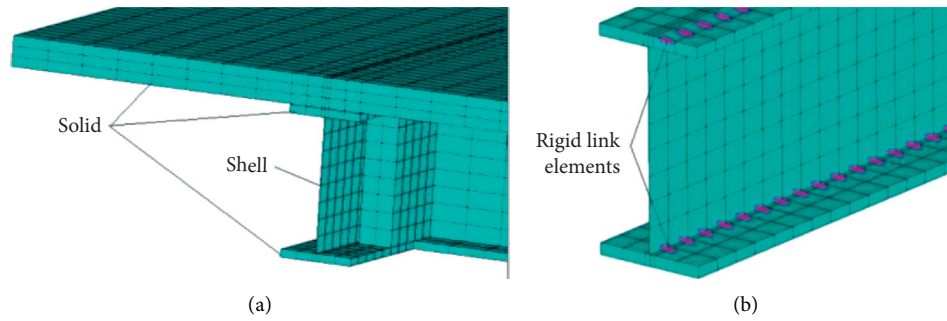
Finite element model and rigid connections of the GFRP-concrete hybrid girder. (a) 3D finite element model. (b) Detail of rigid connections.
